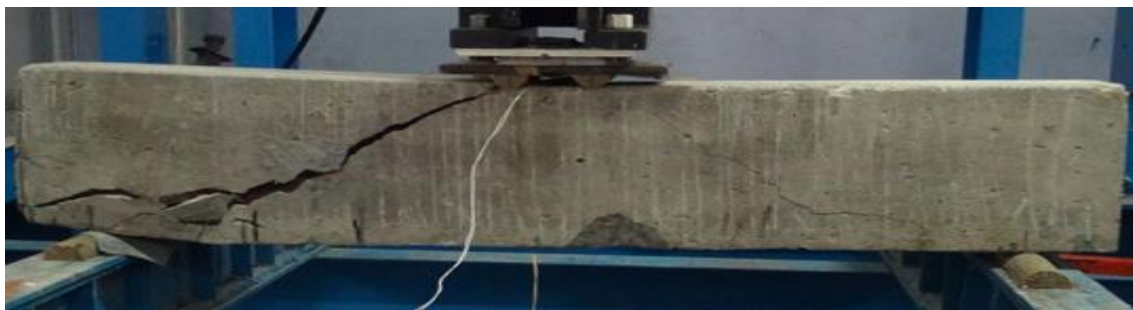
Failure mode of NSM strengthened beam with hand lay-up CFRP bars
